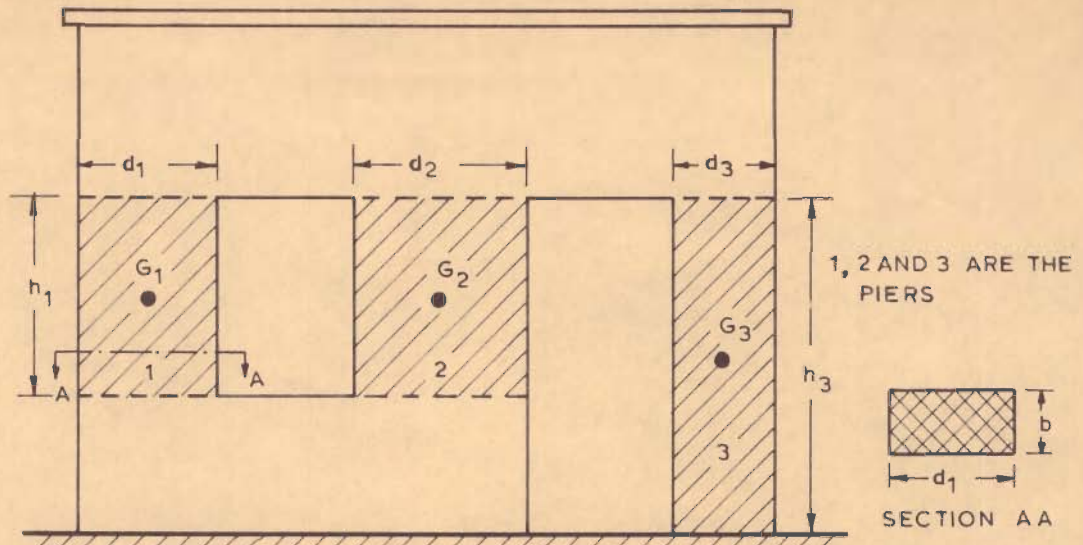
\_BRICK SHEAR WALL WITH OPENINGS
